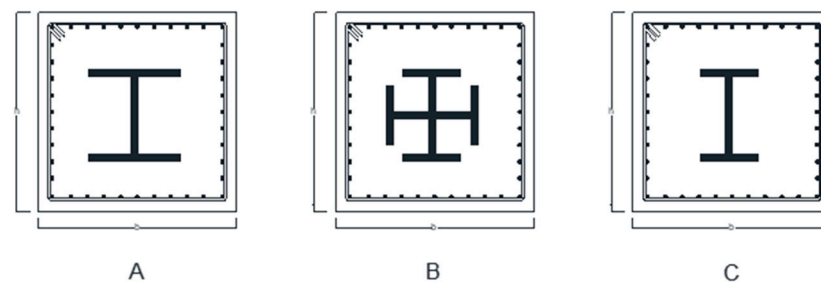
Typical cross section of CES columns. (A) H shape section, (B) Combined I shape section, (C) I shape section.
